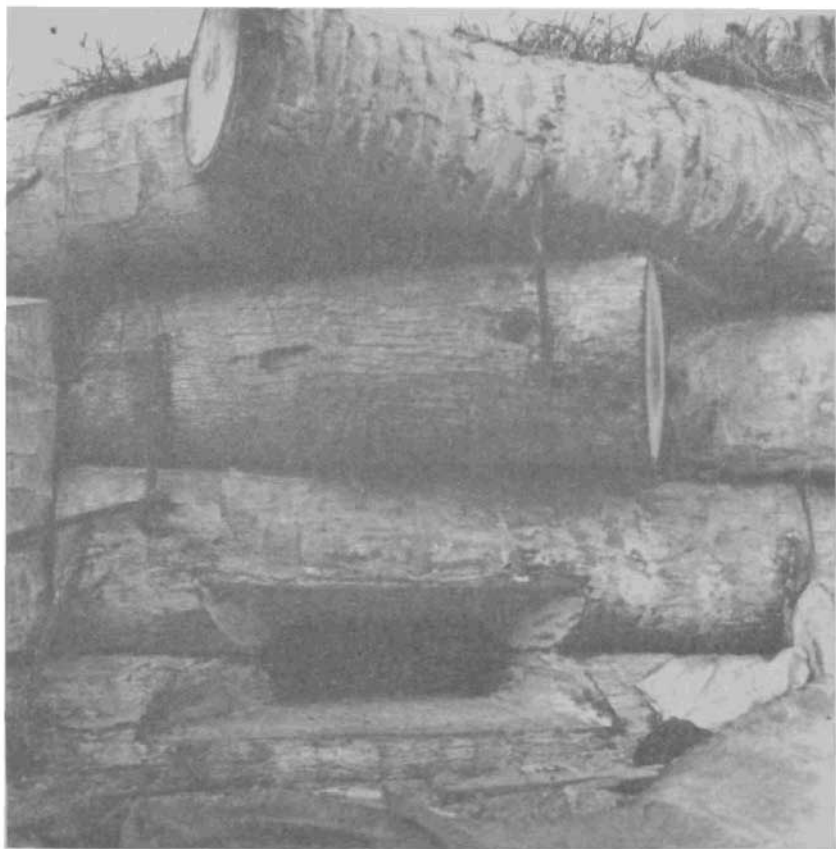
Front View of Typical Japanese Pillbox (Betio).
